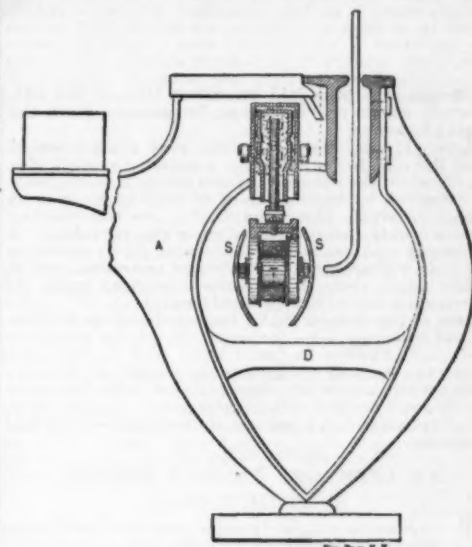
FIELD'S ELECTRIC RAILWAY CONDUIT.
